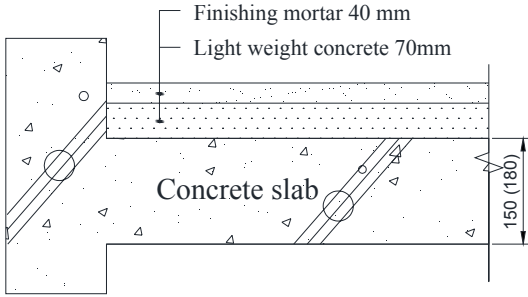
Cross-section of floor structure integrated with floor finishing layers(finished floor)
